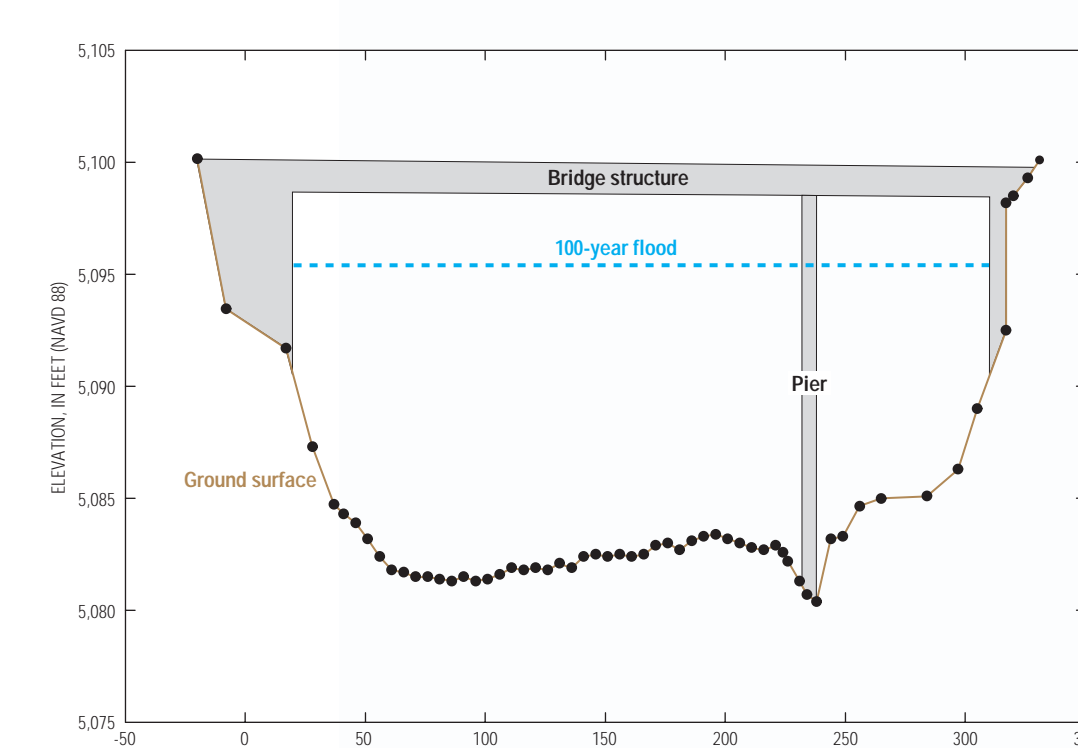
Cross section 149, which is typical of a location in the upper study reach with bridge and pier.
